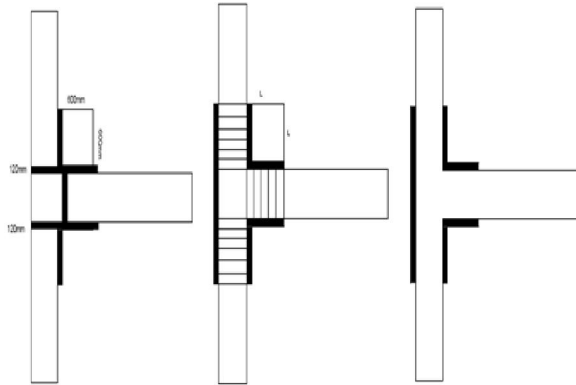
The specimen of strengthened external joints E₁-E₁₄, before and after beam and column wrapping
